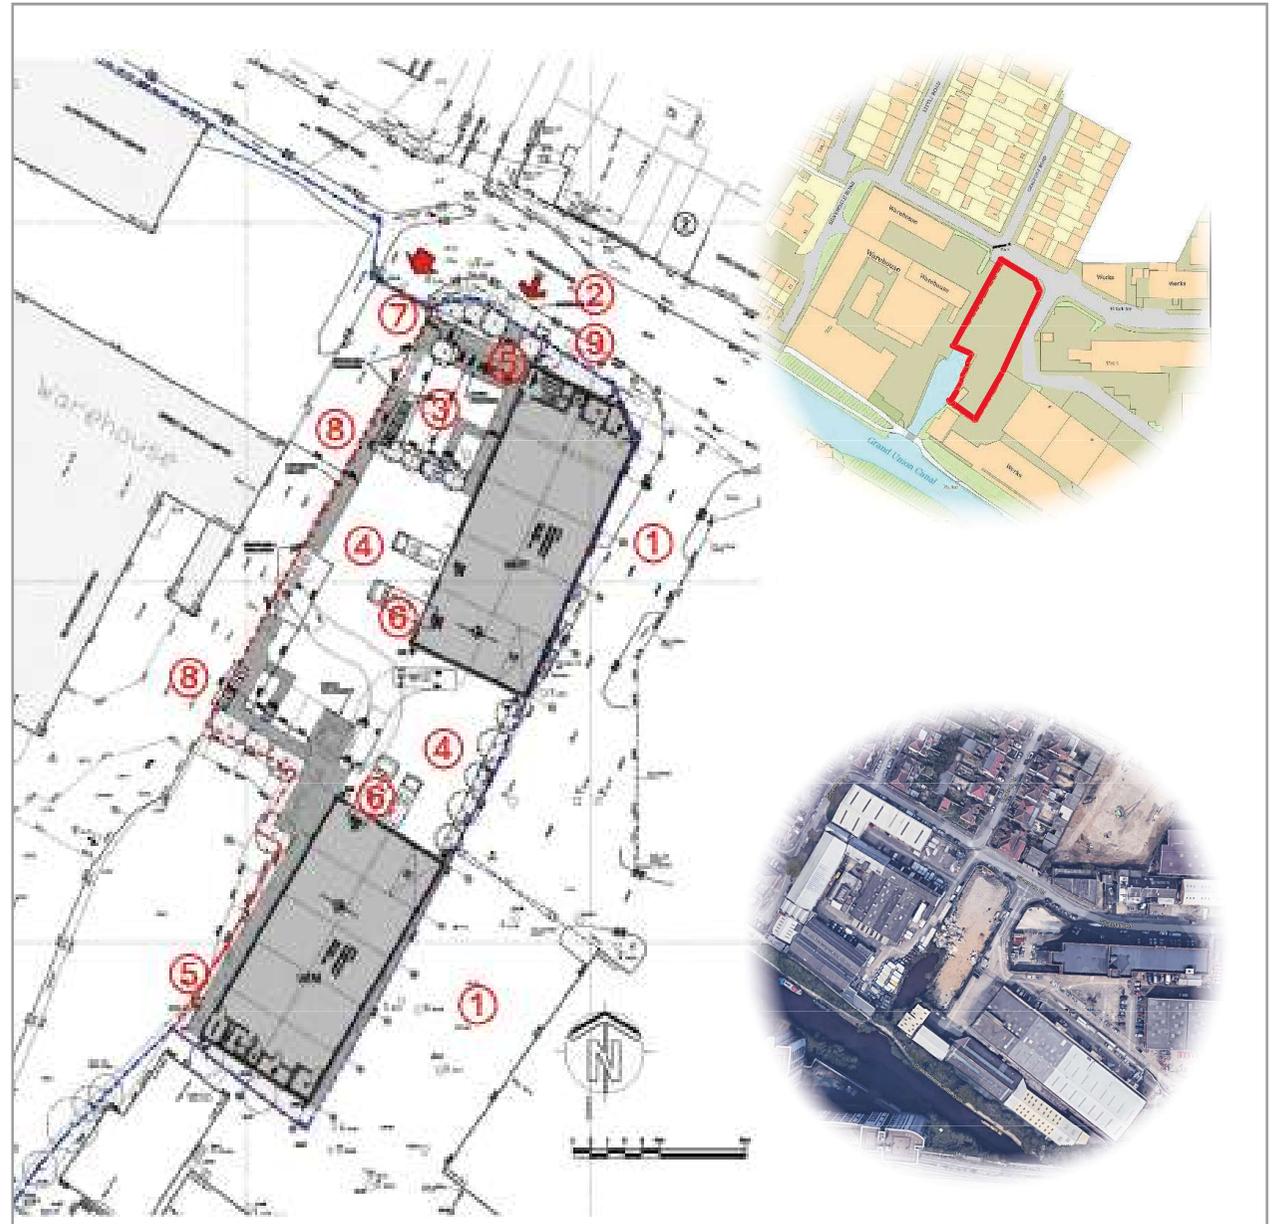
A Site Layout (extract from Drg. No. 122016 P1002 P03)
